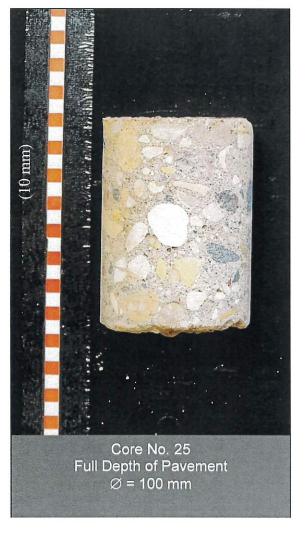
Specimen from Stillwater Road, Southbound Lane
